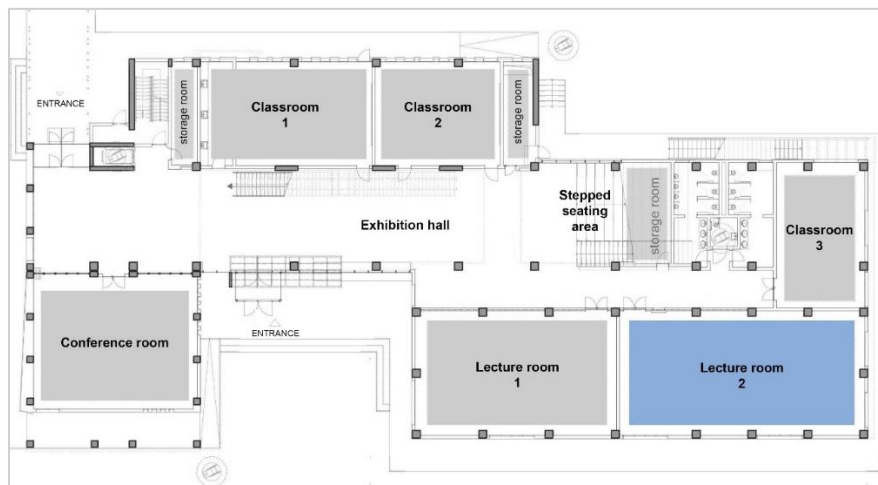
Location of LR2 on the ground-floor plan of the Faculty of Architecture building.
